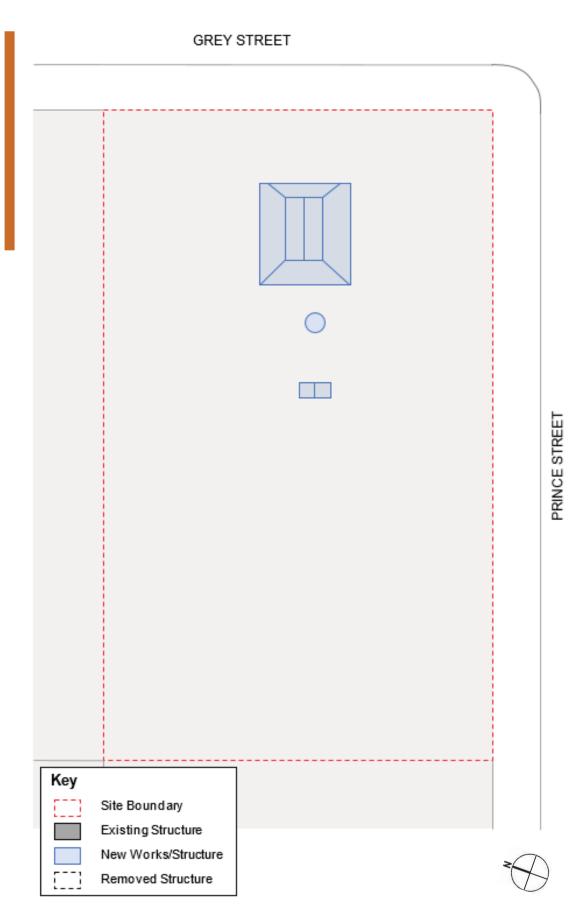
Clarence Town Courthouse and site period of construction - 1869
